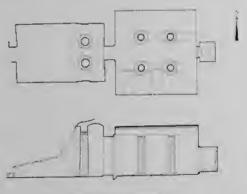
Plan and section of Amenembat's tomb (After Newberry, Bent Hasan 1, pl. 4)
